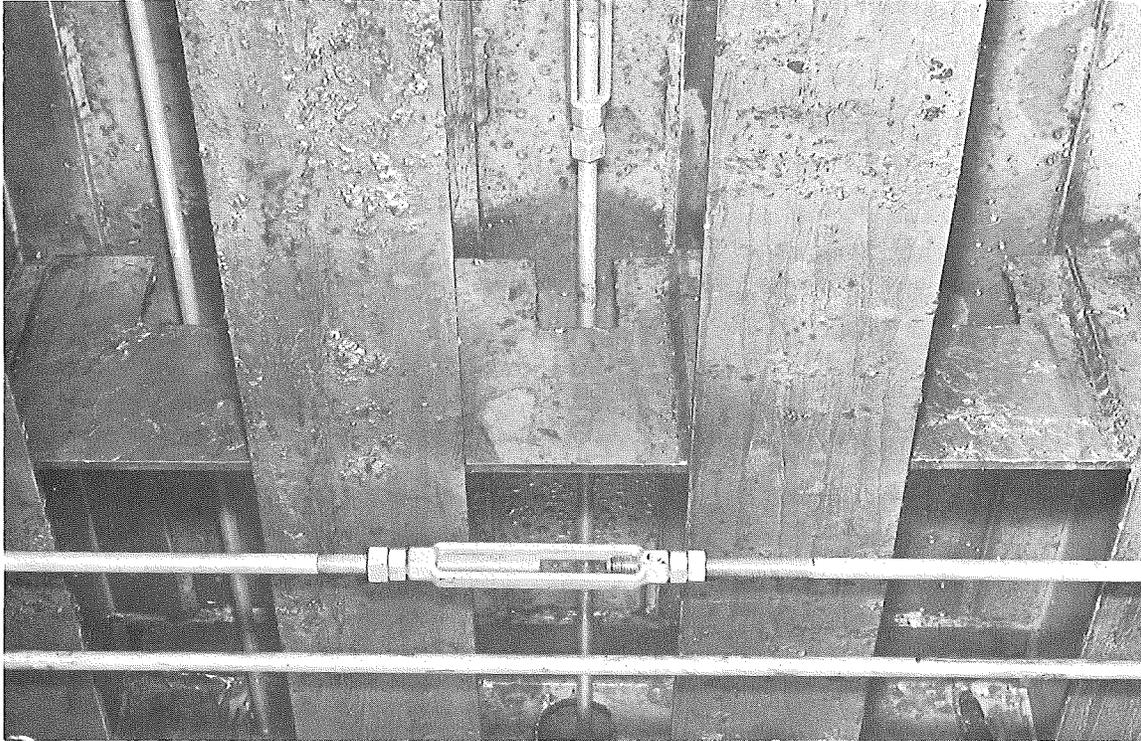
Underside of Platform No. 1 showing diaphragms and longitudinal (top) and transverse (bottom) anchor rods.
